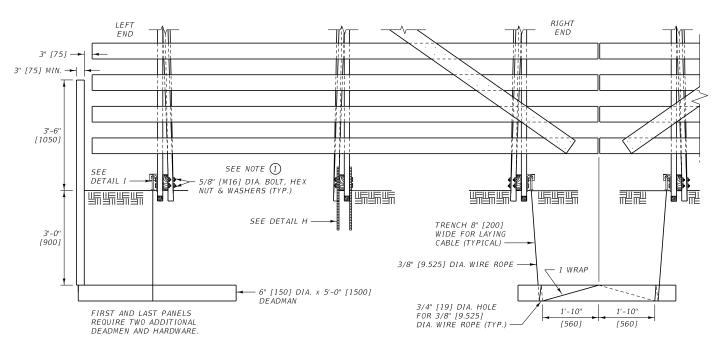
DETAILED DRAWING REFERENCE DWG. NO. STANDARD SPEC SECTION 607 607-40
